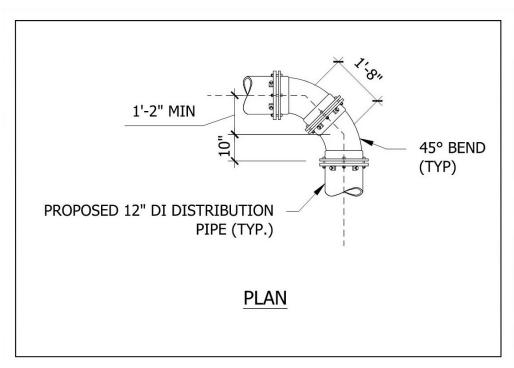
Typical 90° Degree Horizontal Bend - 12" DI Pipe
